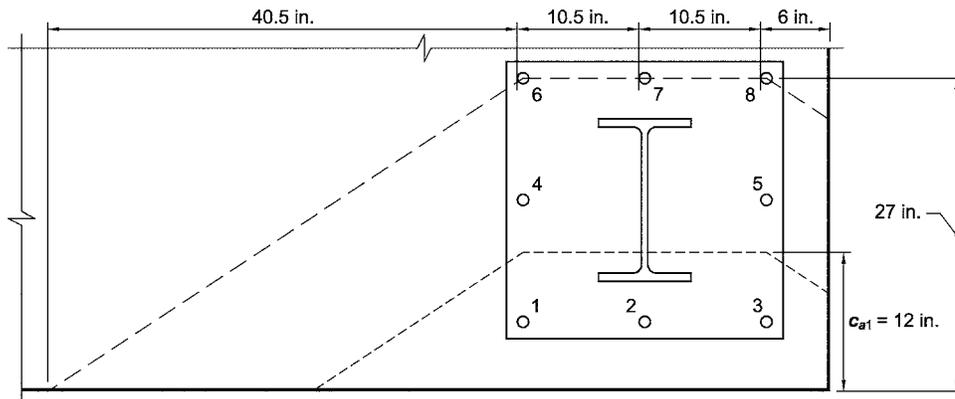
Example 10: Determination of projected failure area for shear loading.
